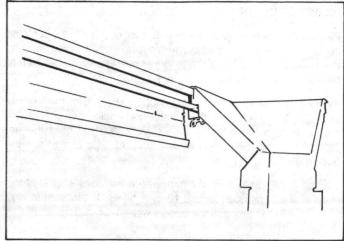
Inside Corner, Mounting Strip, and Locking Clamp (Front View)
